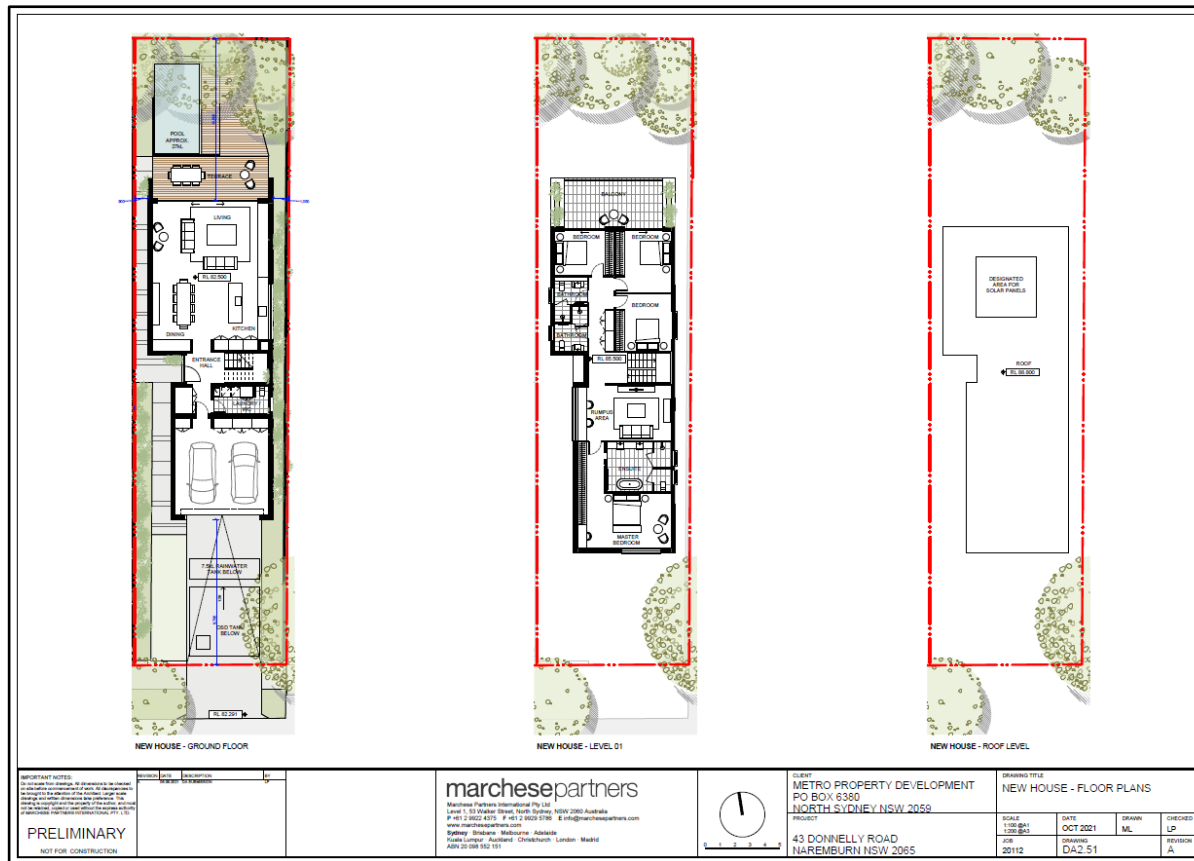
Proposed floor plans of the new dwelling next to the existing presbytery.
